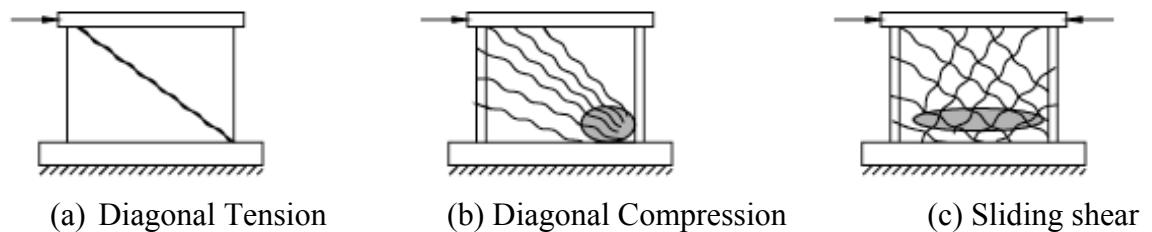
Failure Modes of Squat Structural Walls (Paulay and Priestley, 1992).
